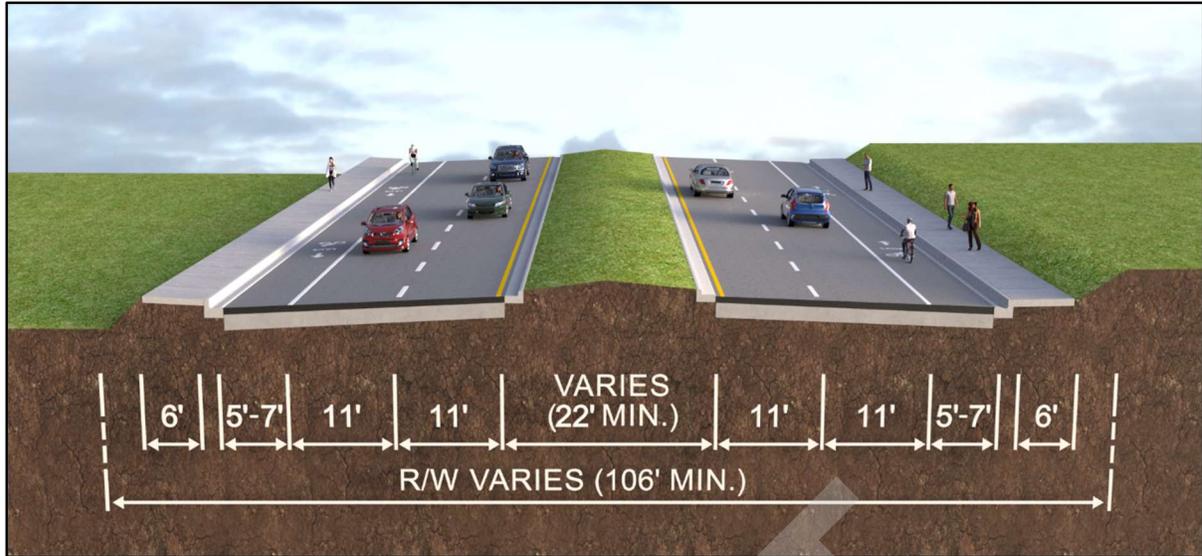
Branch Forbes Road - Proposed Typical Section
